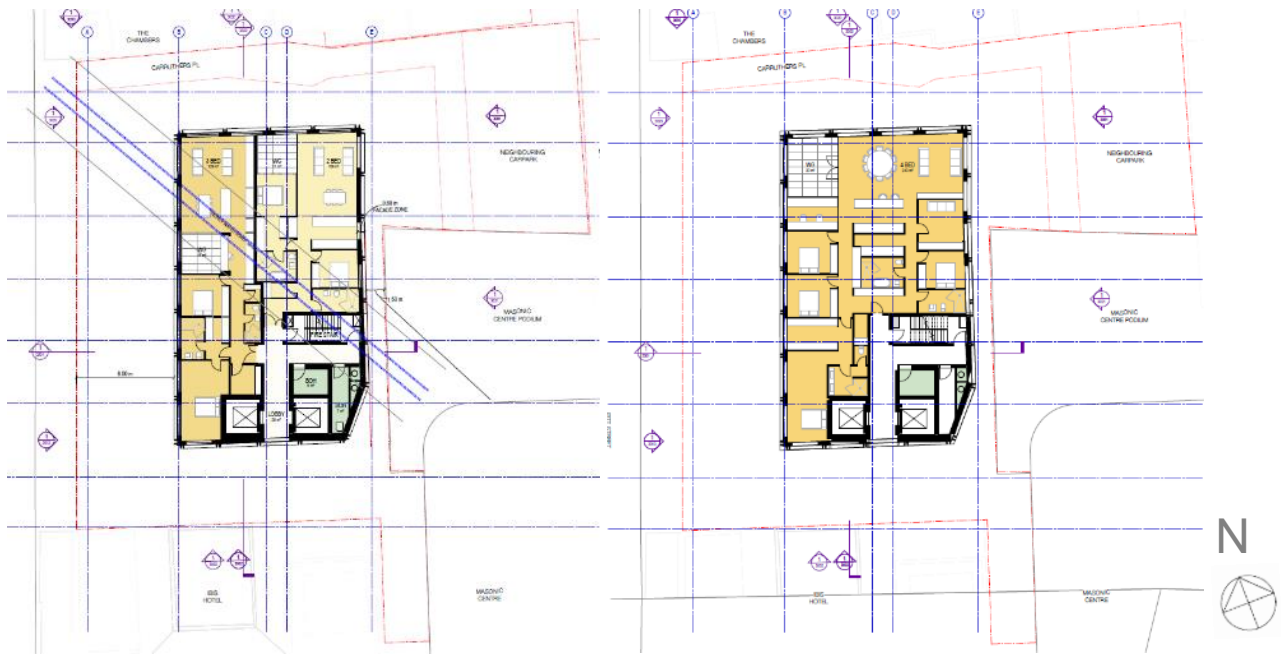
and 54: Indicative ground floor plan (left) and level 1 plan (right)
